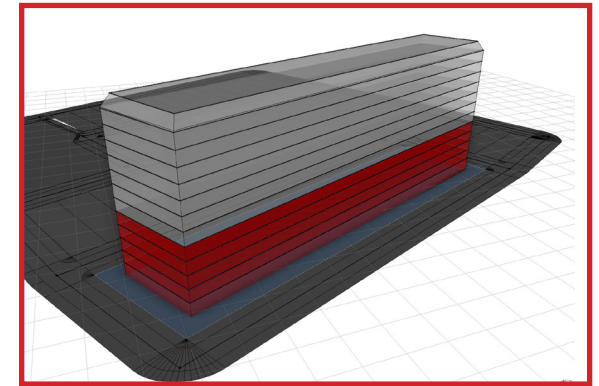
The building envelope depicts 5 floors of commercial use.
